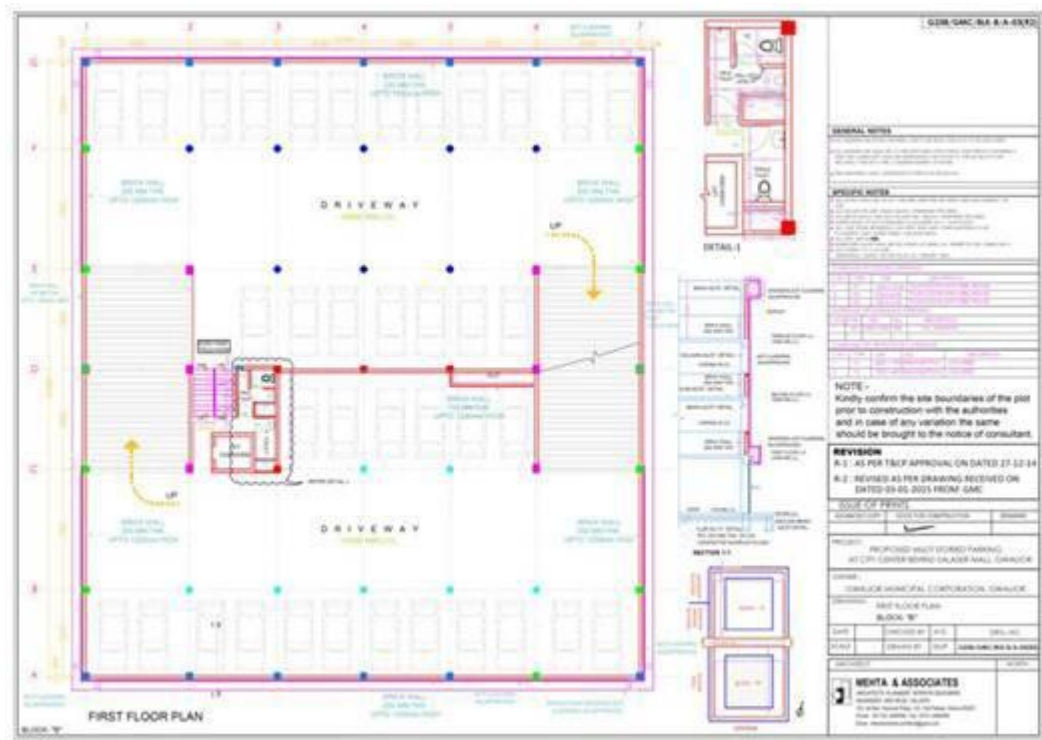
Parking Location: Salasar Multi Level Parking (First Floor-Block B)
